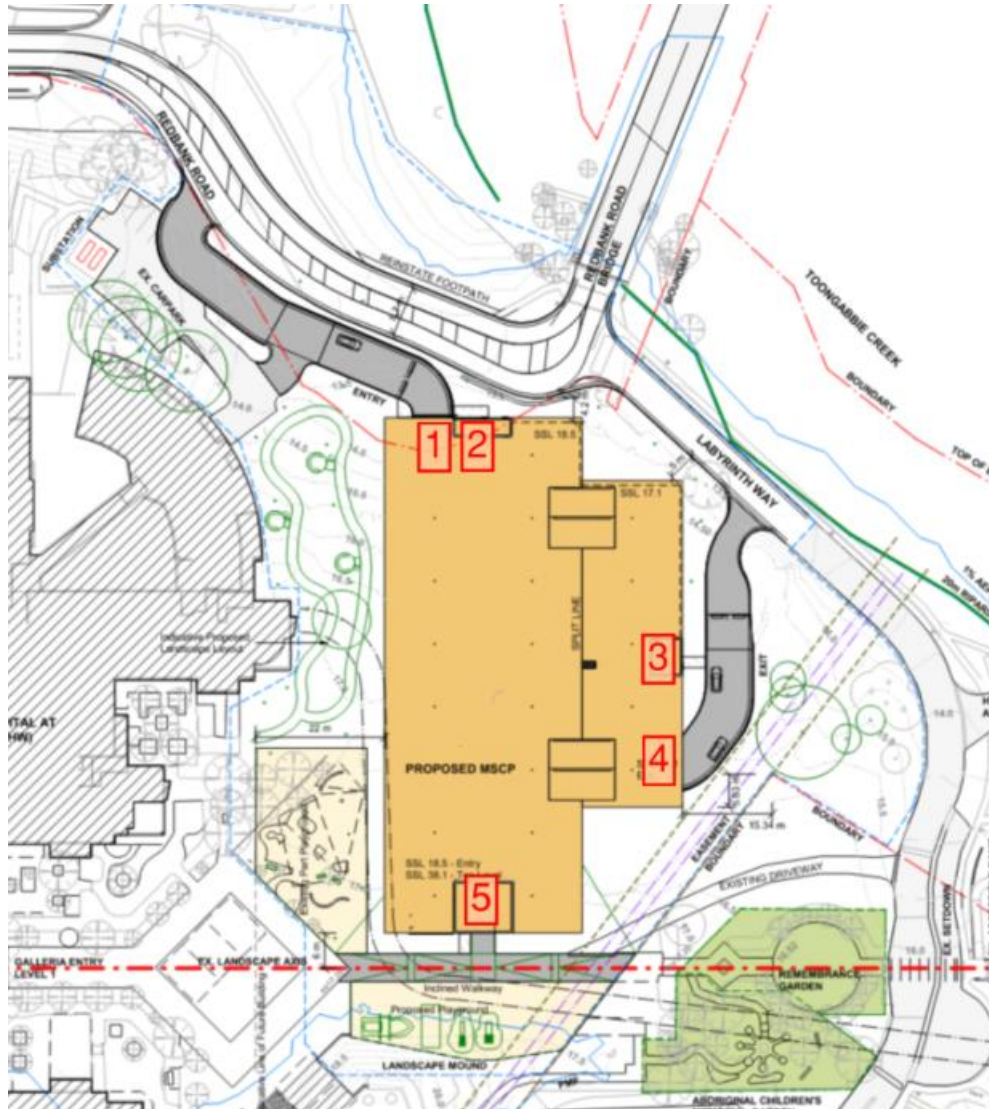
MSCP floor level and entryway plan (source: BLP proposed site plan dated 15/01/2021)
